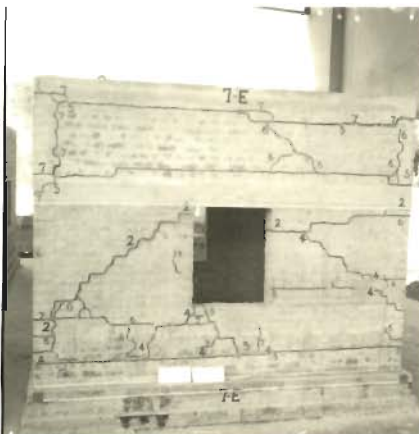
\_ MANY NEW CRACKS APPEARED IN EAST CROSS WALL AFTER SHOCK NO. 7 (MODEL 7)
